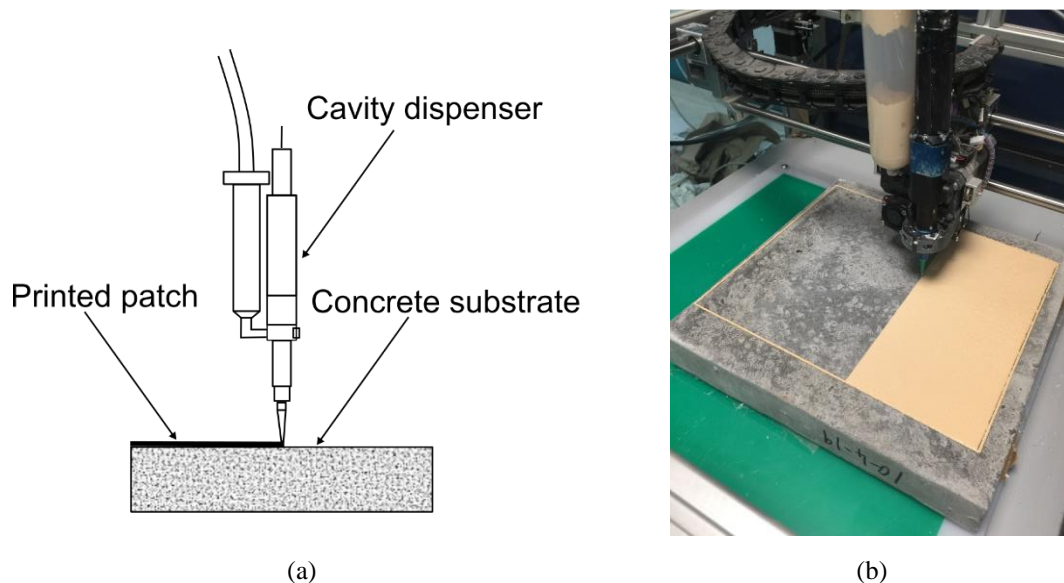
a) Schematic diagram and b) photograph of AAM being extruded onto concrete slab.
